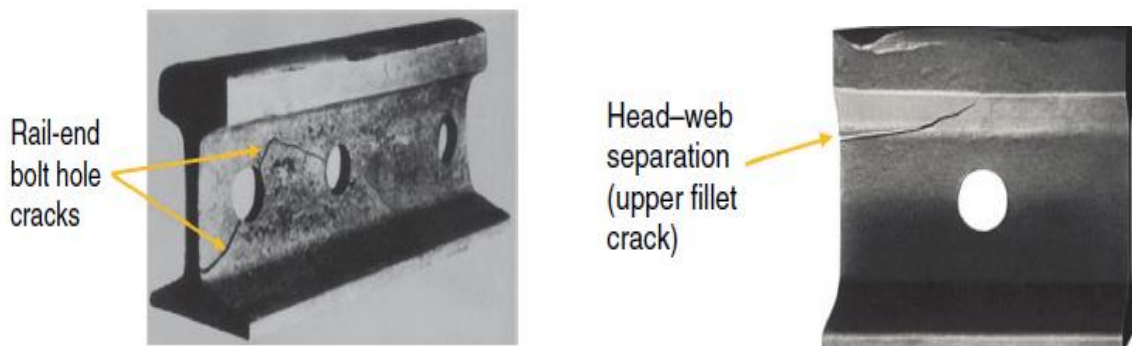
Typical (a) rail-end bolt hole crack, (b) head–web separation
